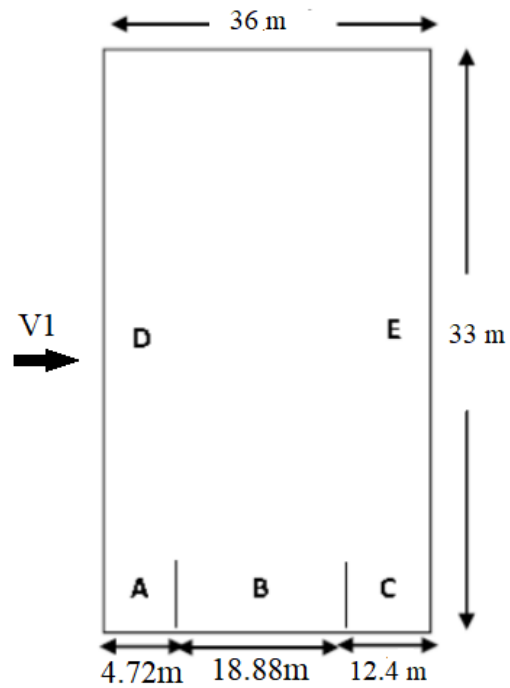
Plan view of the pressure zones on the vertical walls direction V1
